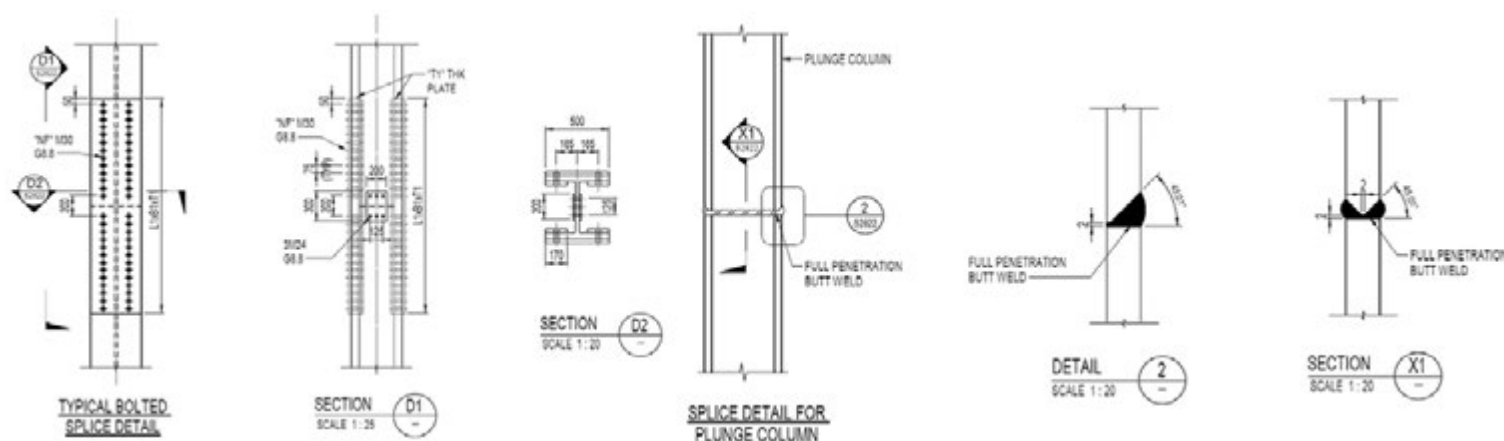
| Traditional splice detailing for columns: Bolted splice (left), welded splice (right)
